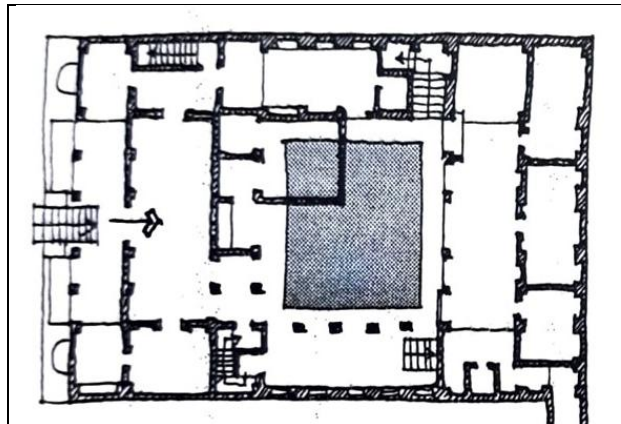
A Typical Layout of a Jaisalmer Urban House
